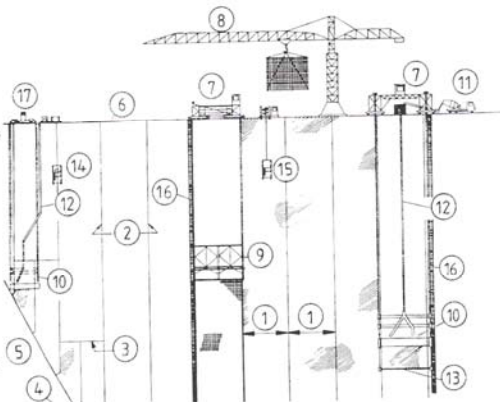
Concrete face sealing with typical arrangement of construction equipment (Kutzner 1997, p.281).
